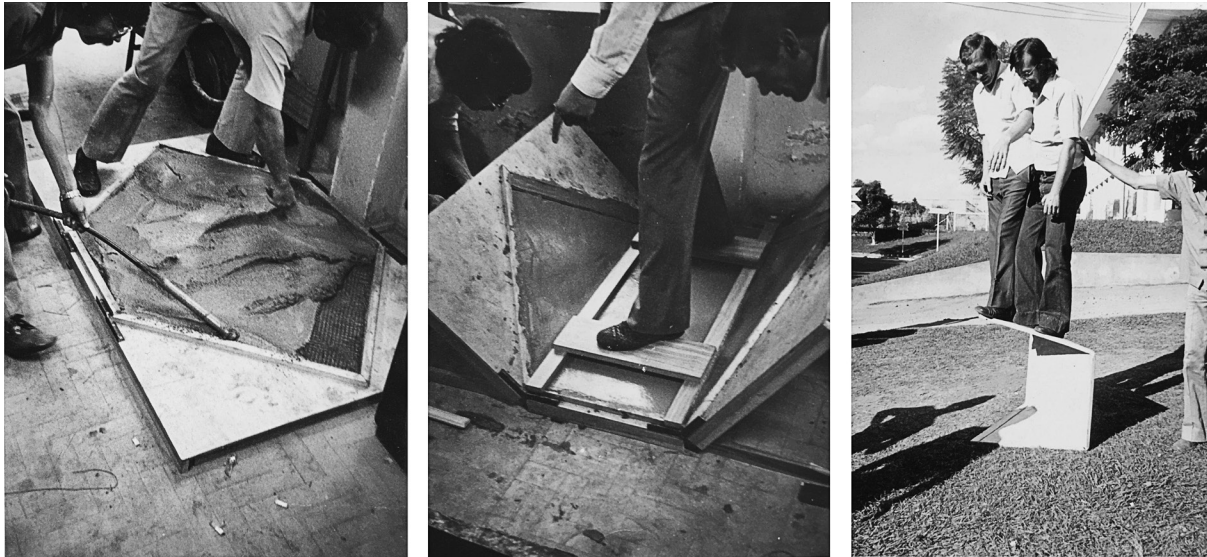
Planalto building's shed (ca. 1972). Prefabrication phases at the Structures Laboratory of the São Carlos School of Engineering. Arquivo Kristian Schiel, Brasília
